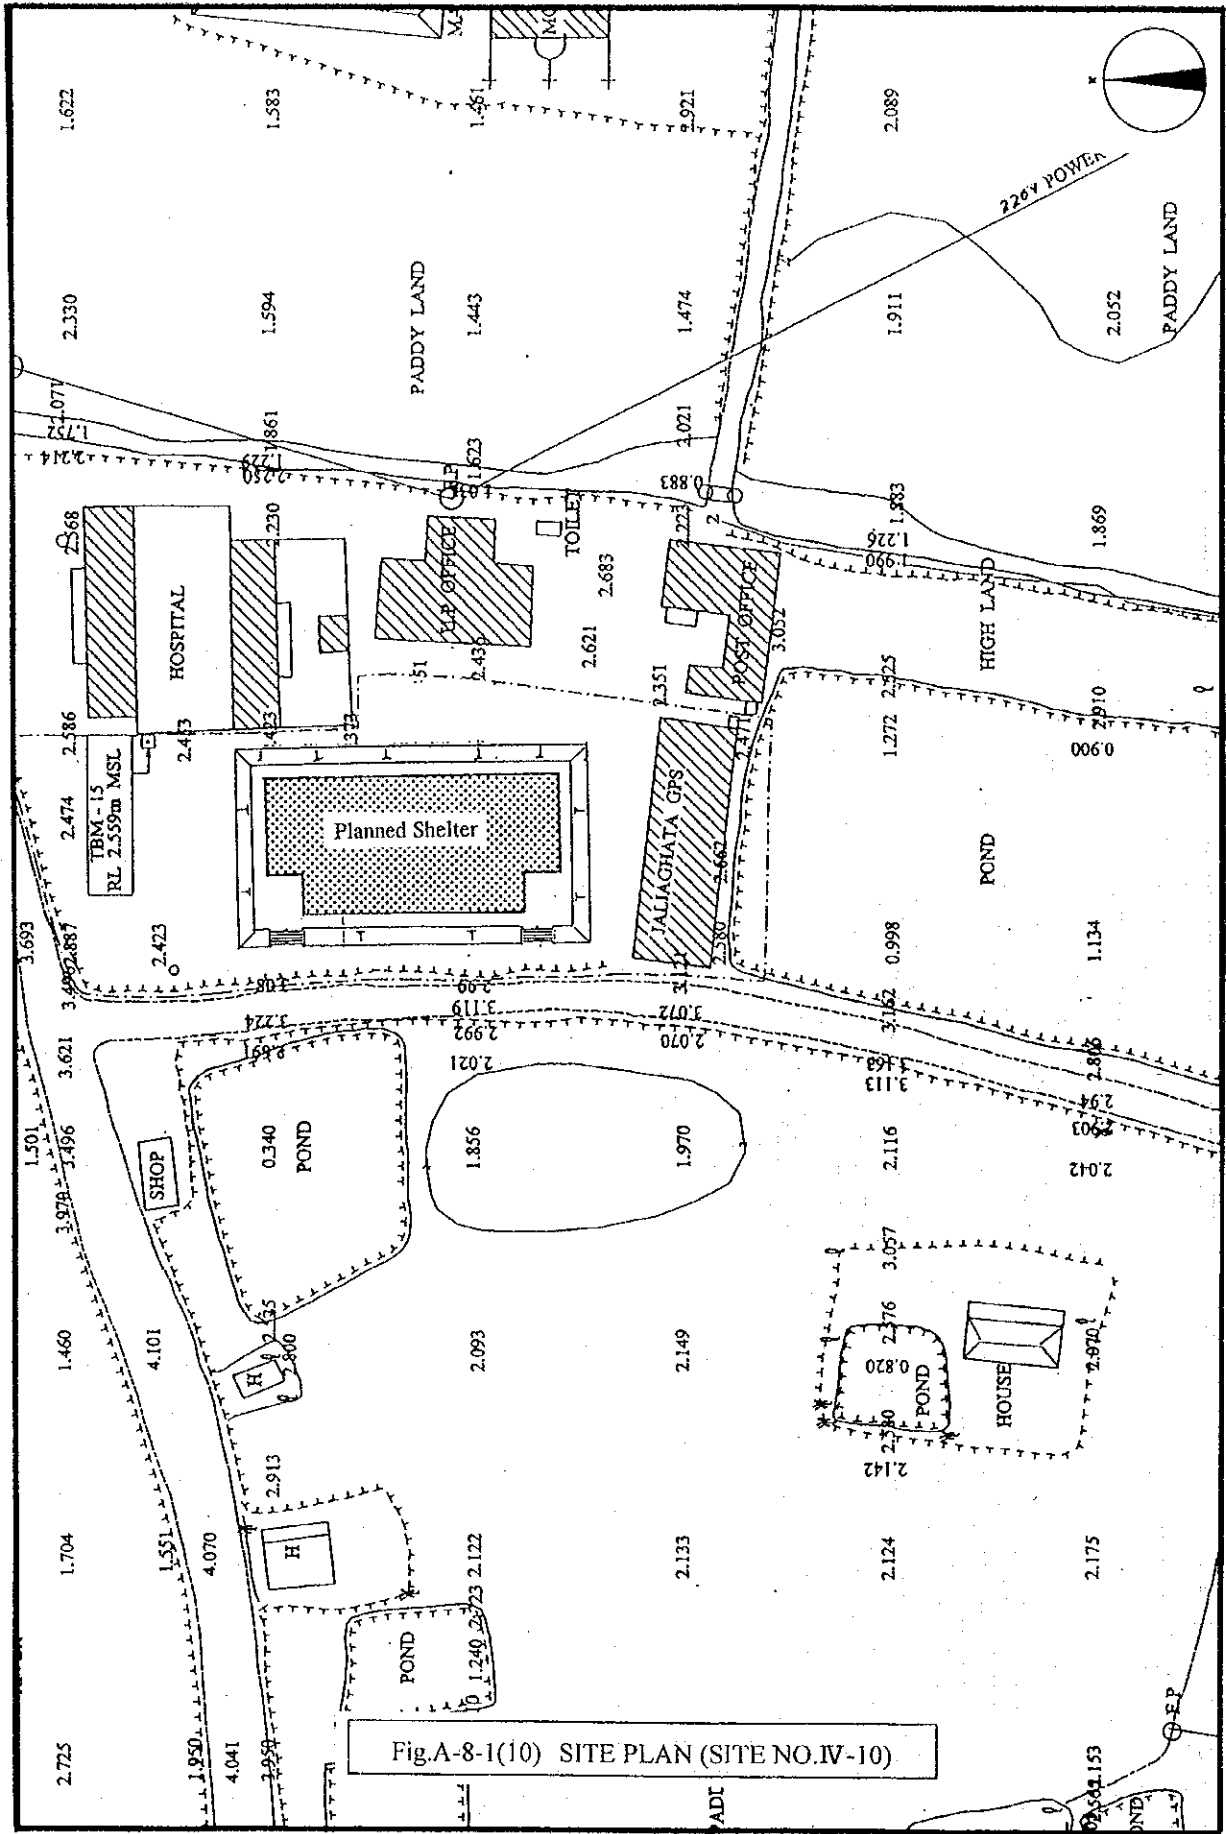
(10) SITE PLAN (SITE NO.IV-10)
